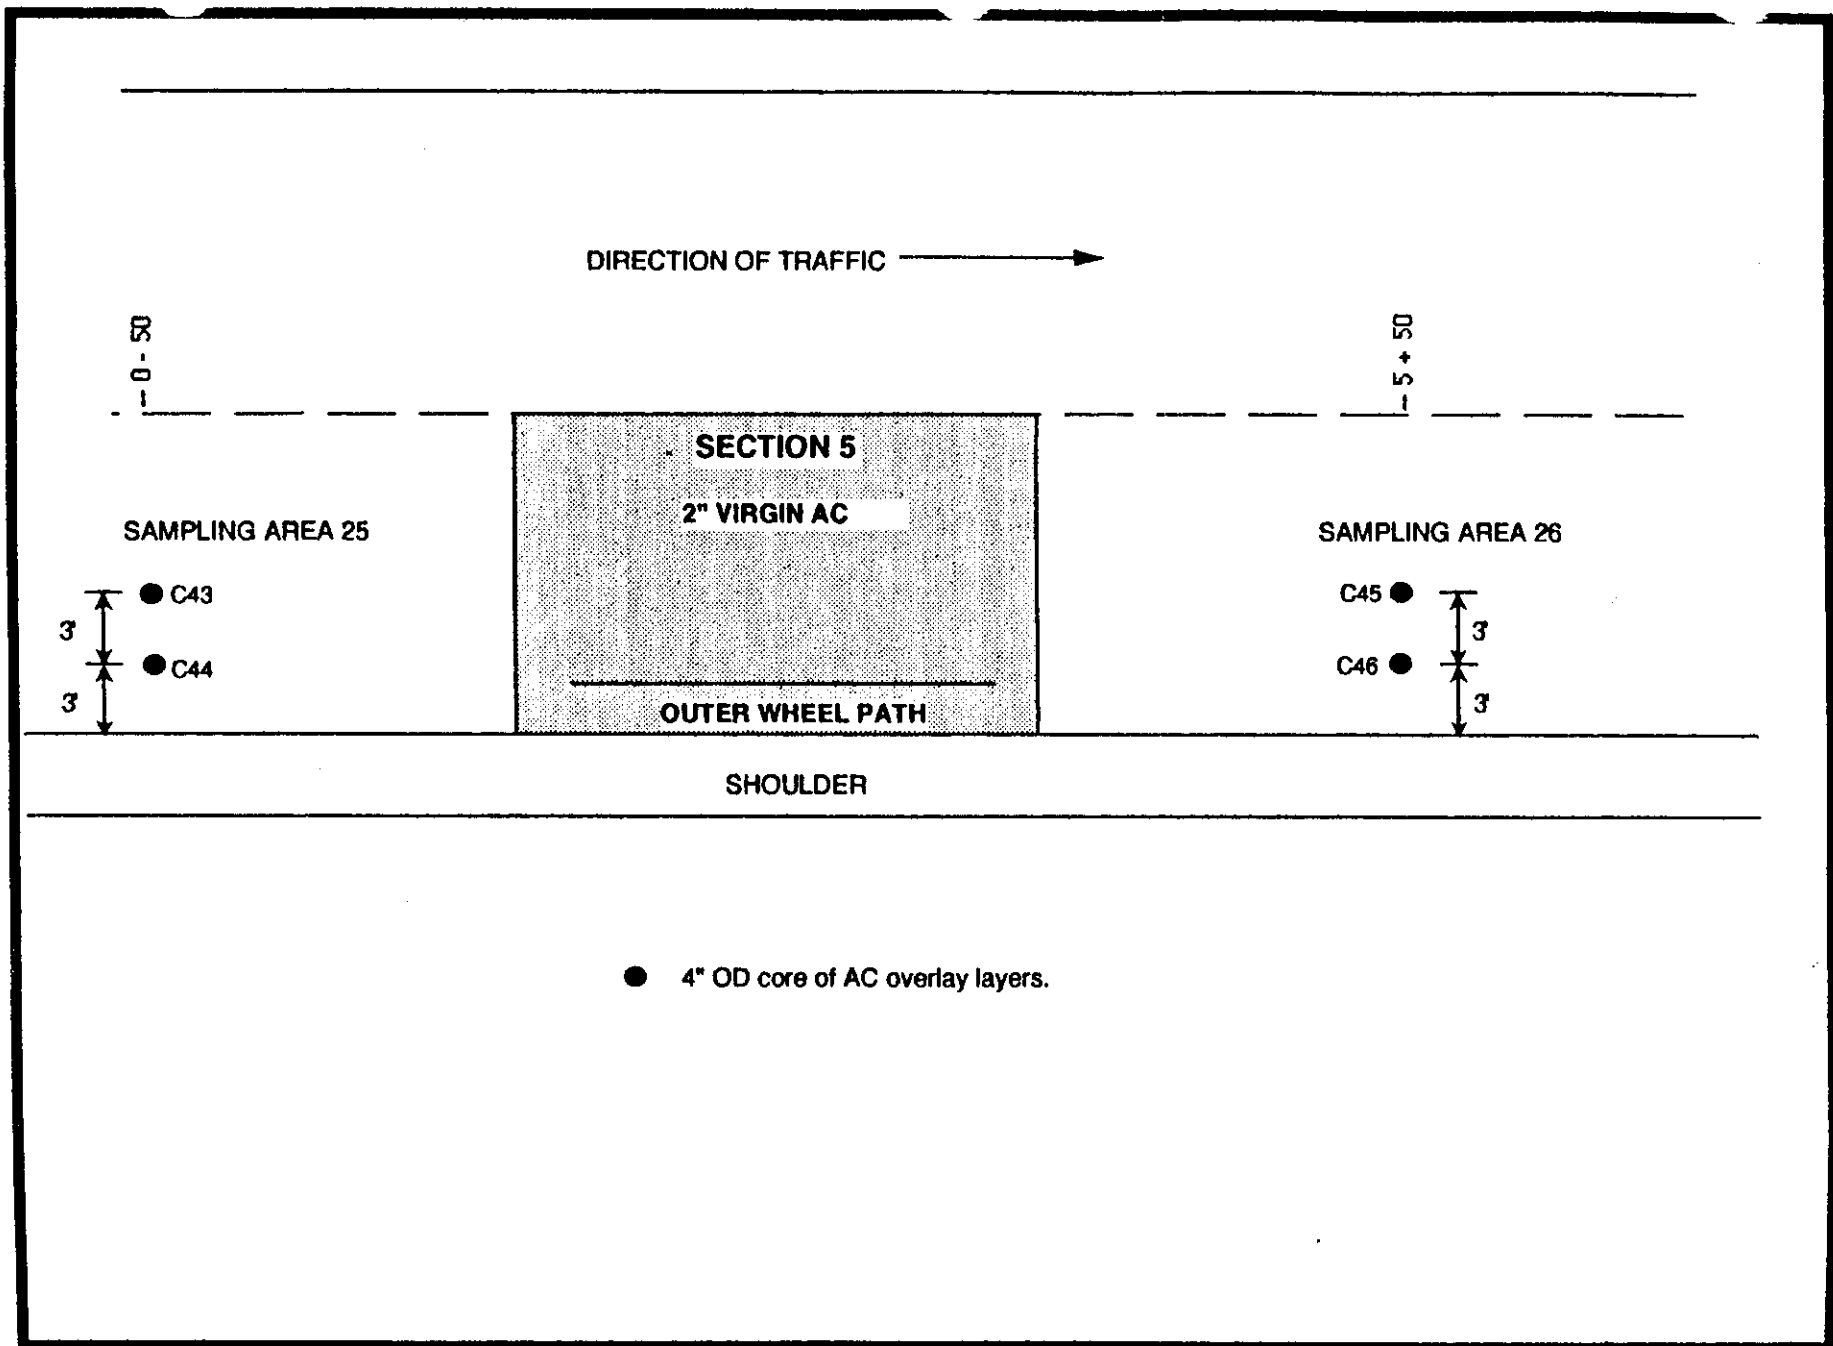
Example of "Post-Construction" Sampling Plan for Section 5.
